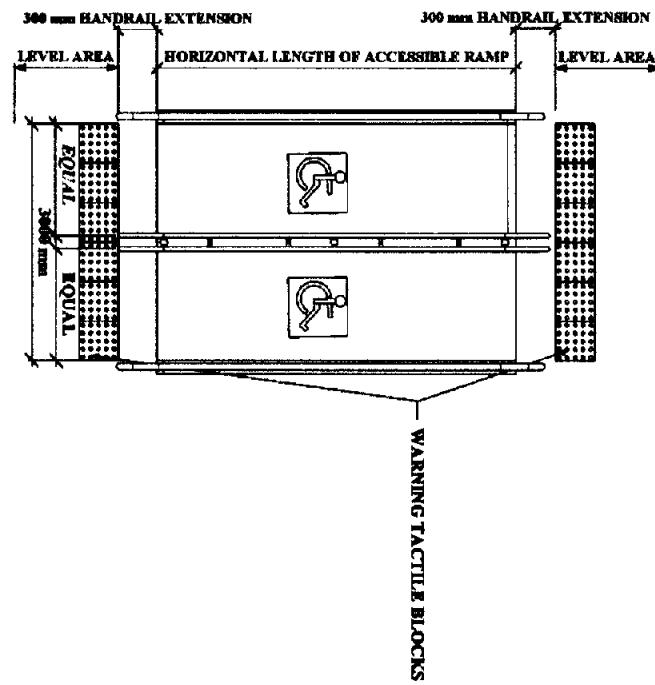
Illustration of a ramp wider than 1200 but less than 3000 mm and which require intermediate handrails.
